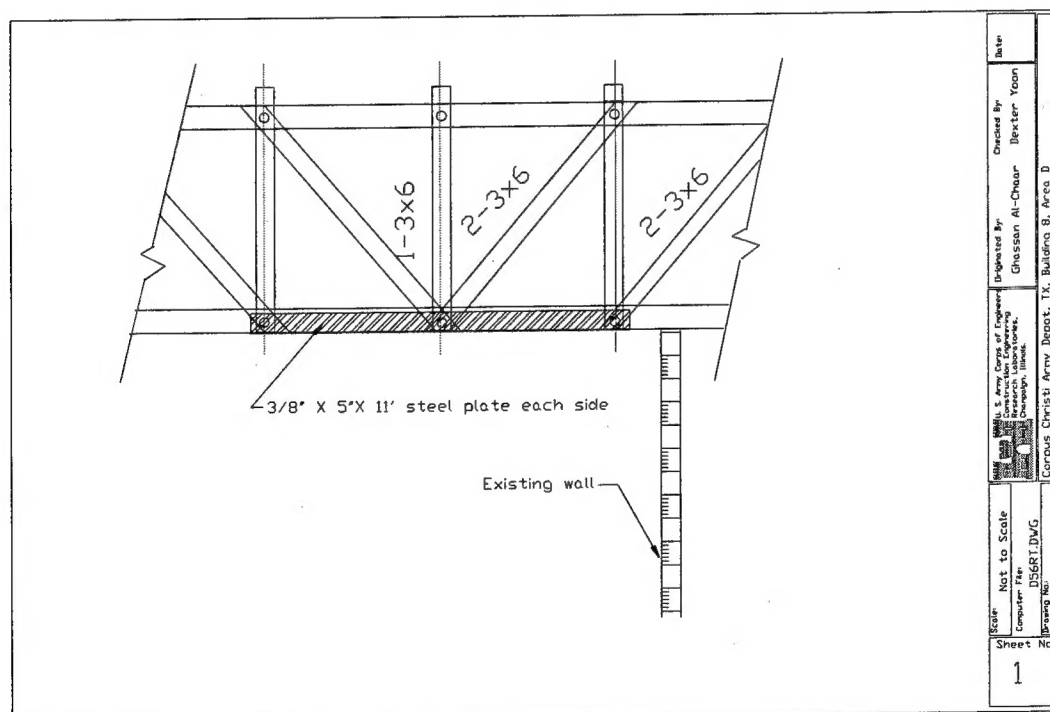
Proposed repair for Member TR in Truss Column Line 56, Area D.
